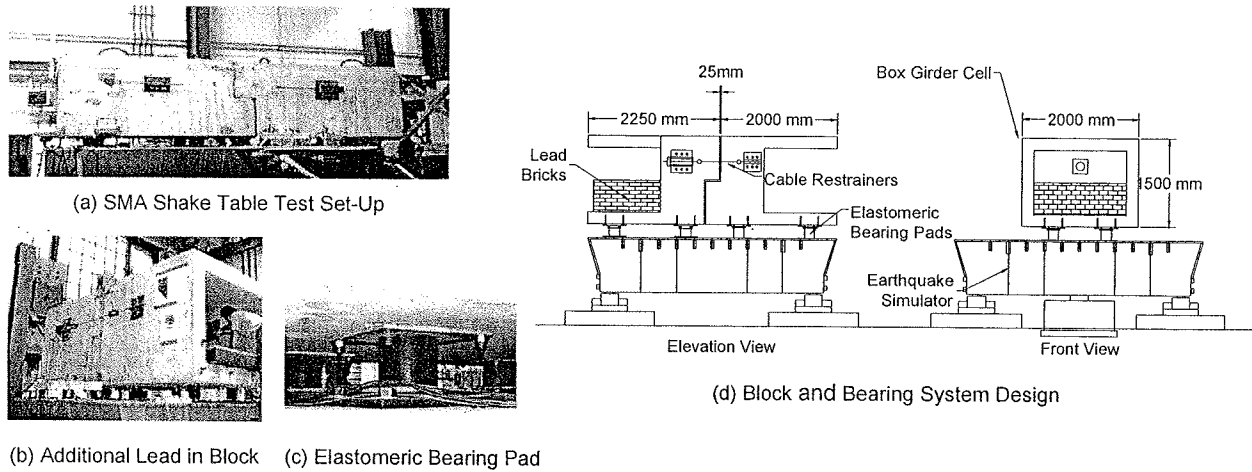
Experimental test set-up representing multi-frame concrete box girder bridge
